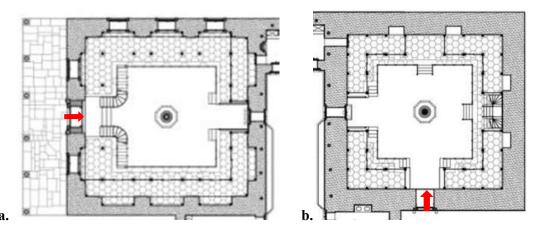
On the left (a) is the men's section undressing plan; on the right is the women's section undressing plan. The red arrows indicate the entrance to the cold room from the exterior (author archive).
